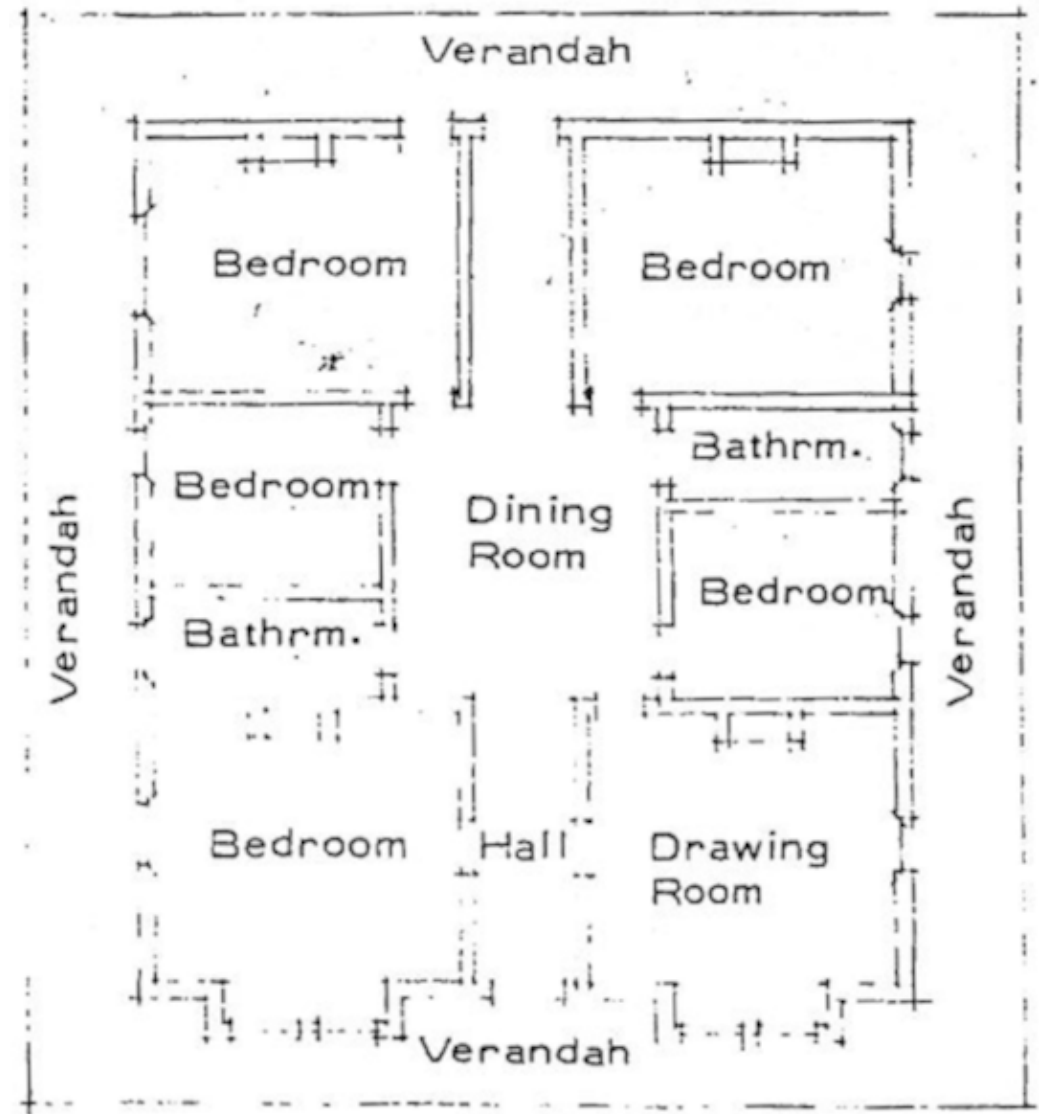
A typical residential layout plan of a house in Kimberley - 1889 (McGregor Museum, 2022: online).
